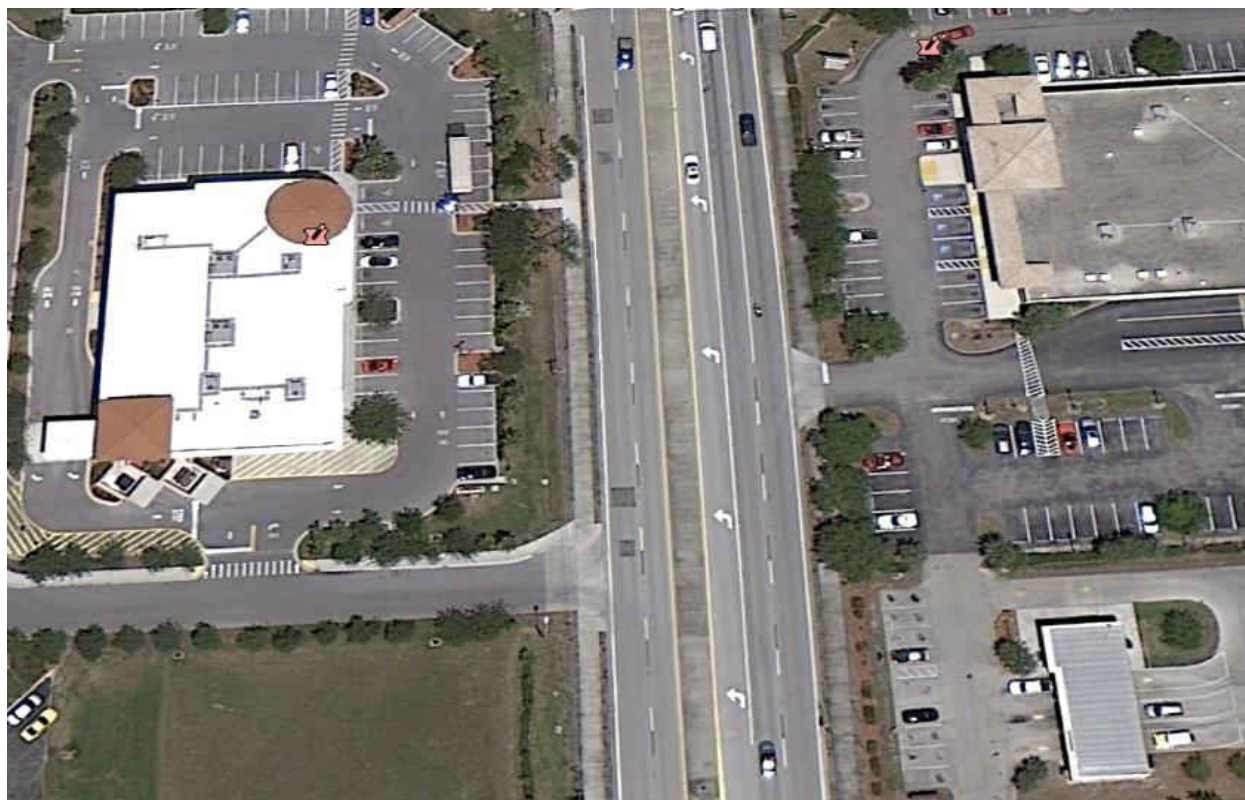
An Example of Concrete Curb Median (Source: Google Earth)
